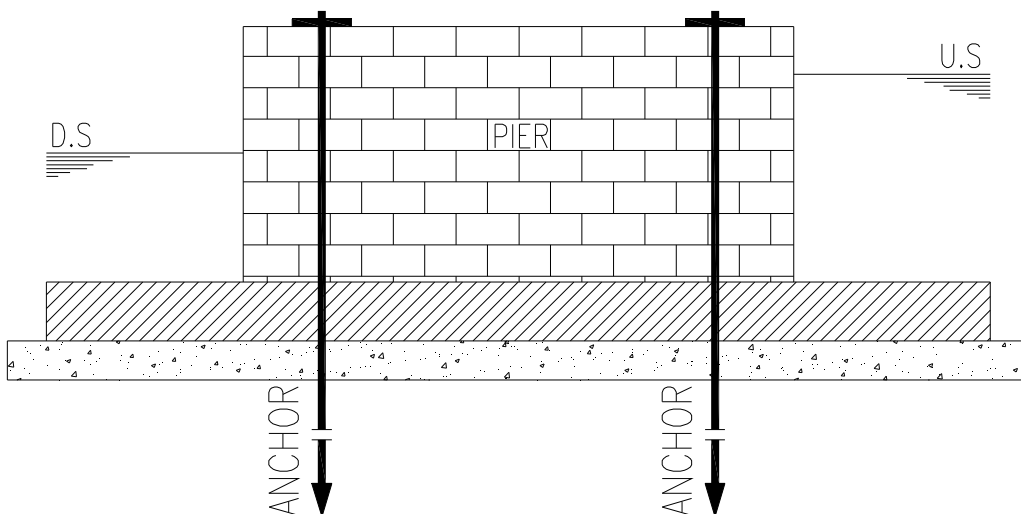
Anchor Profile (Pier Side View without Bridge Drawn)
